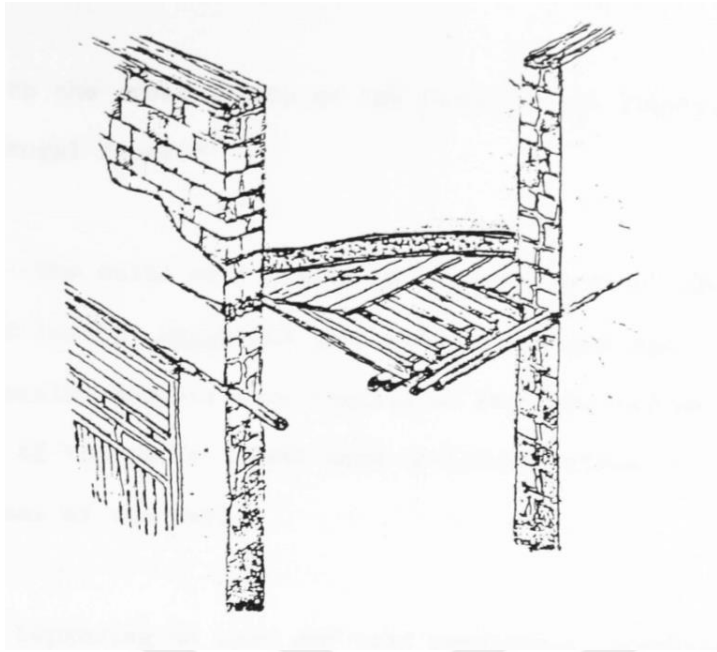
Structural detail of coral stone structure (Al-lyaly,1990)
